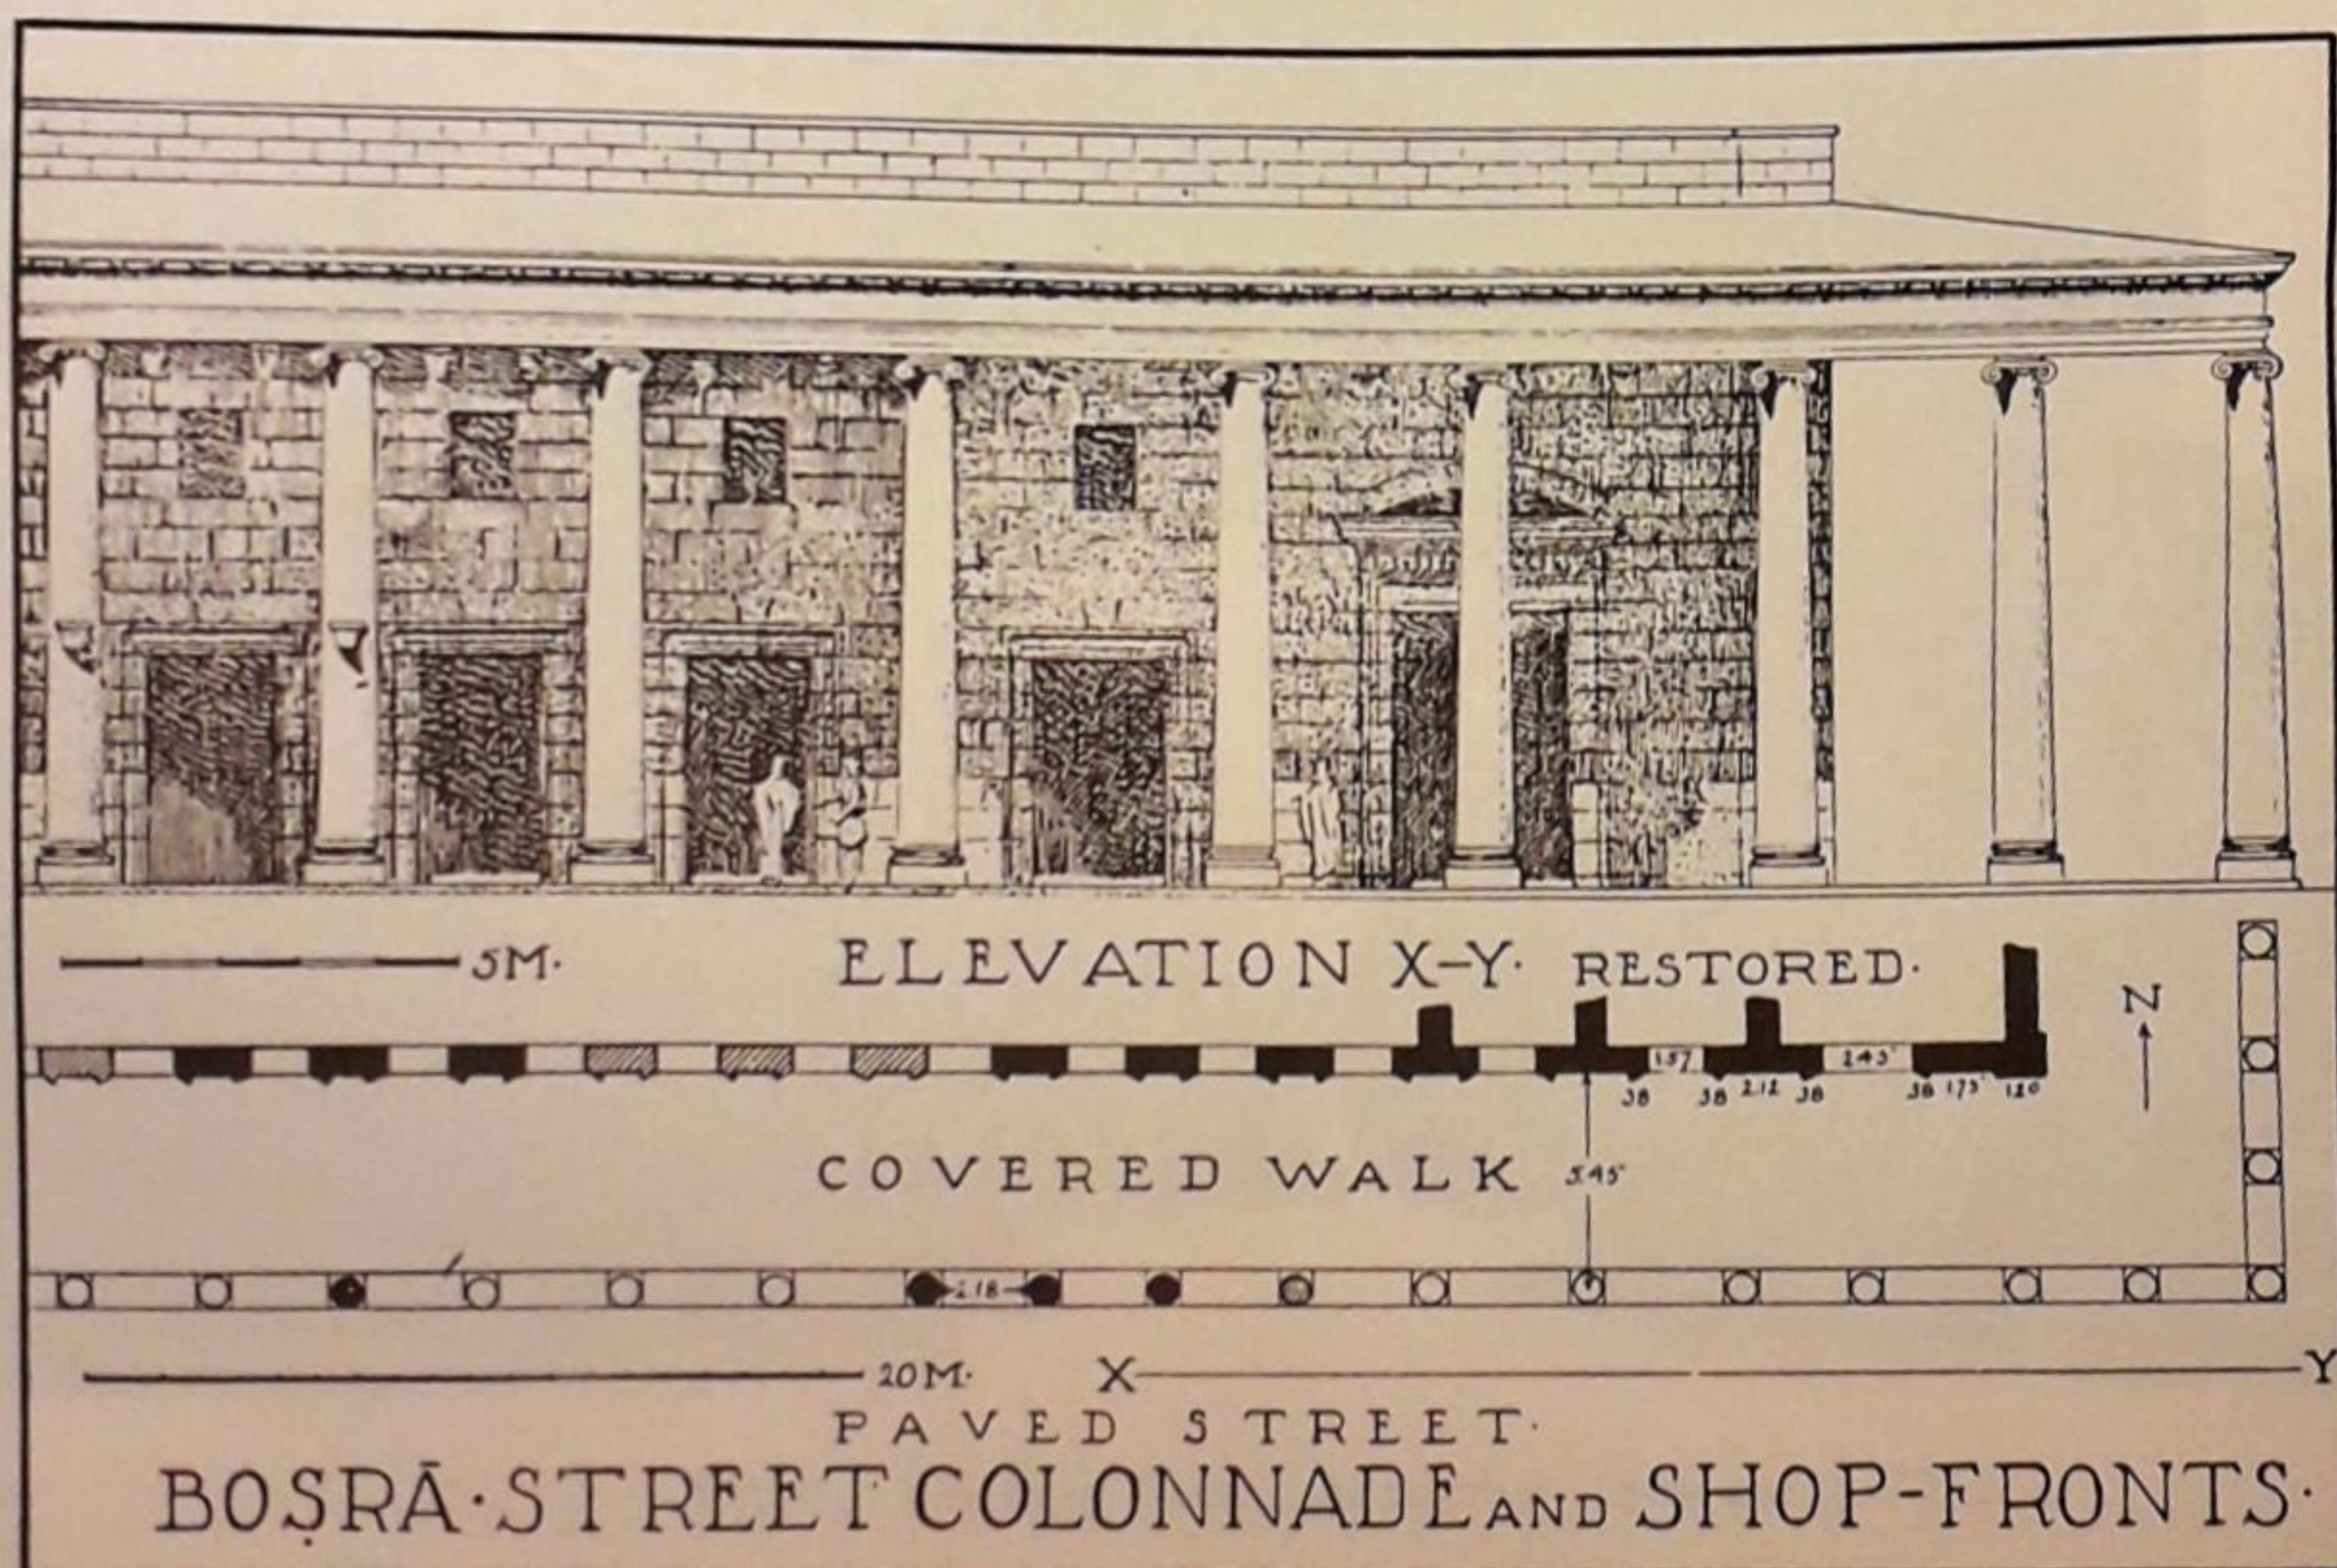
Bostra, facade of the shops along the colonnade street, proposed reconstruction.
